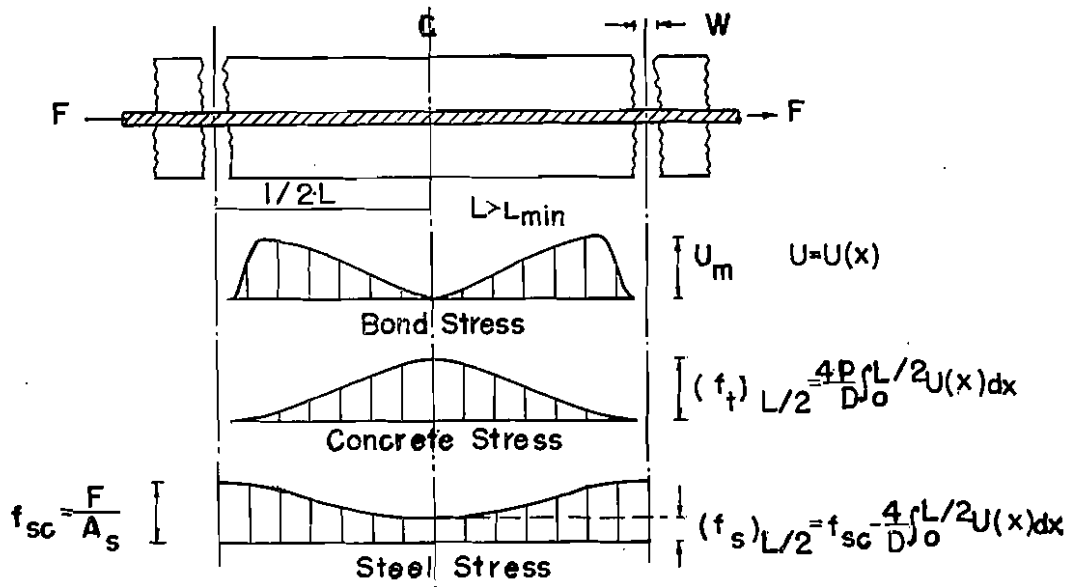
LONGITUDINAL STRESS DISTRIBUTION AFTER FOLLWING CRACKS HAVE DEVELOPED IN AXIALLY LOADED MEMBERS.
